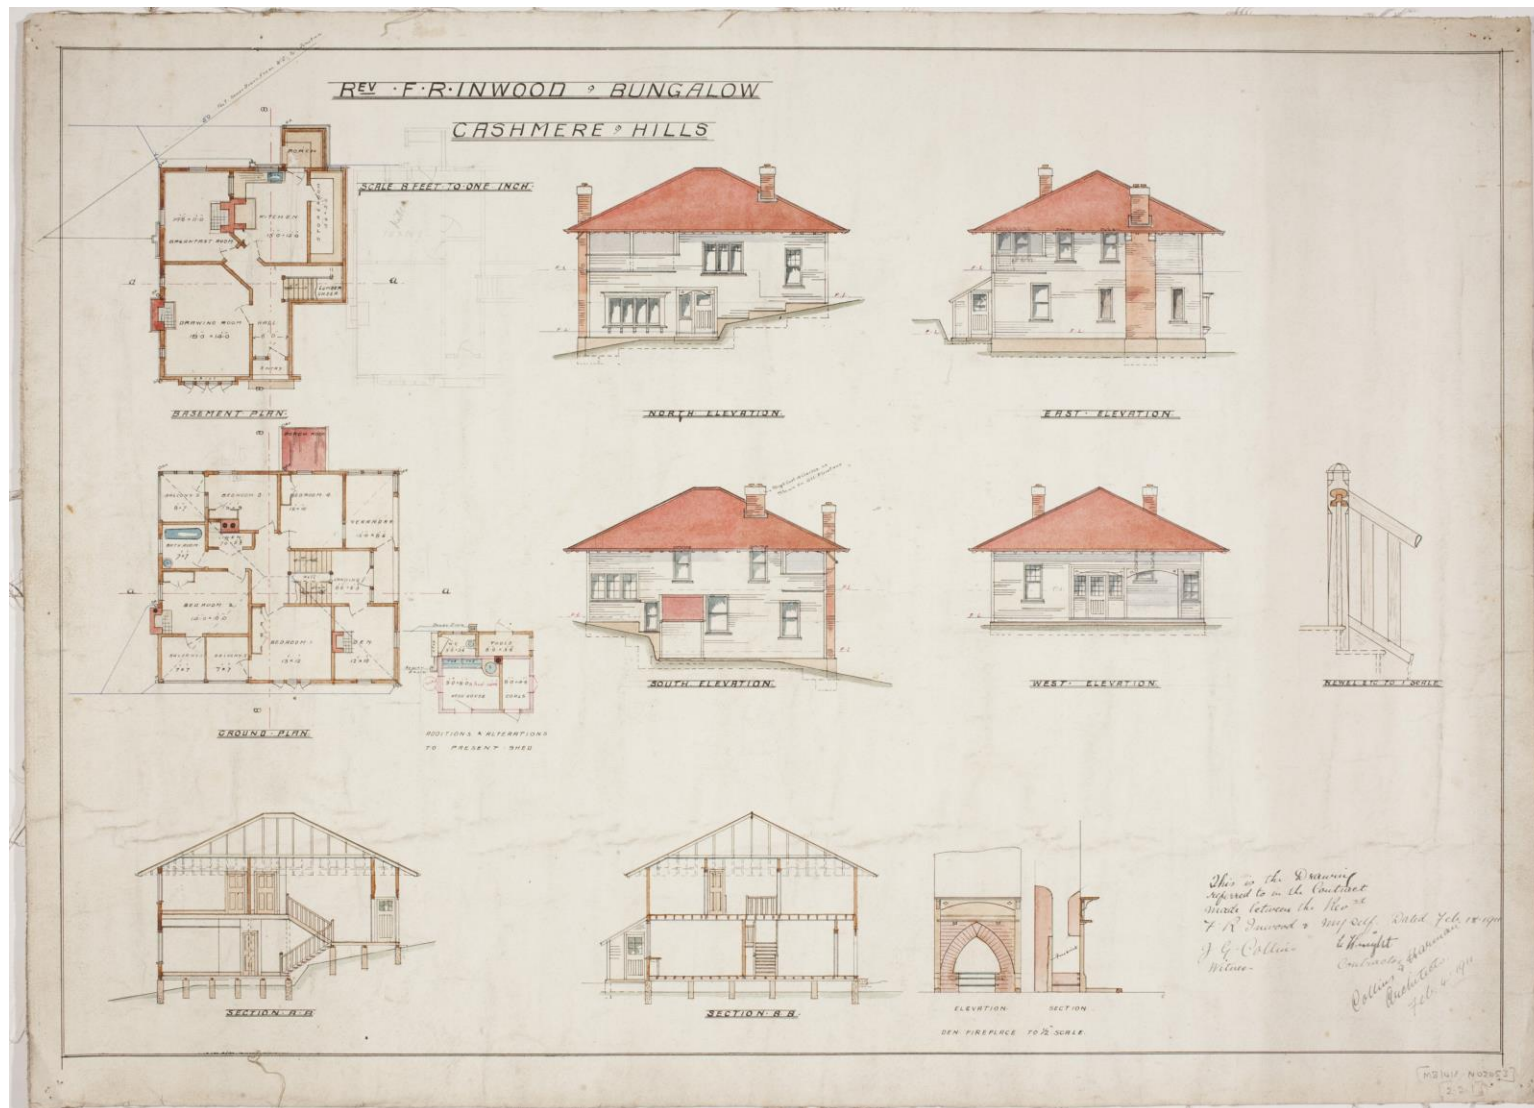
Collins and Harman, Reverend F. R. Inwood, Bungalow, Cashmere Hills, plans, elevations, sections and details (1911).
